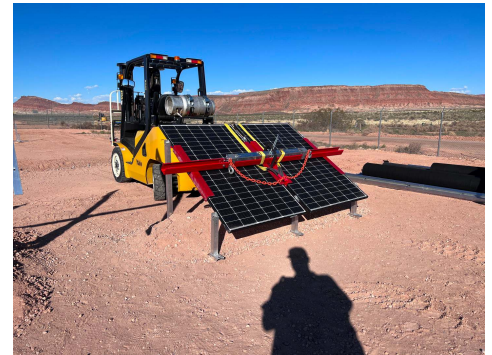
Test setup - IR-30 Solar Racking System with red test cross frame
